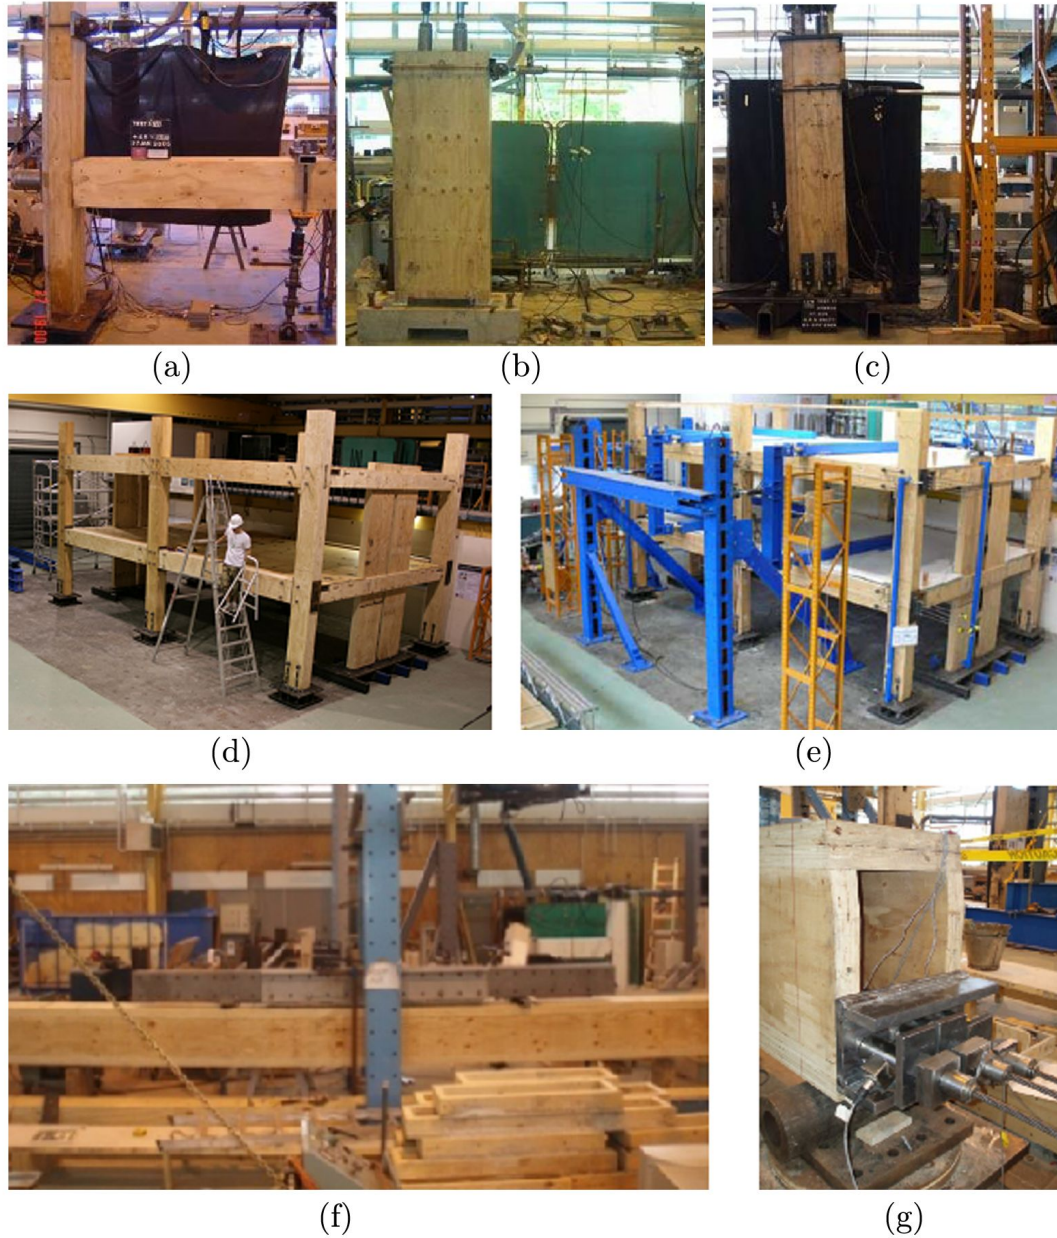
Experimental testing of post-tensioned timber constructions at the University of Canterbury of (a) Beam-Column joint, (b) Wall-Foundation connection, (c) Column-Foundation connection, (d-e) two story building, (f-g) long span gravity beams
